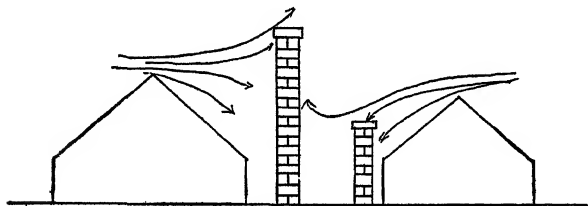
Chimneys should extend above the roofs of adjacent buildings.
